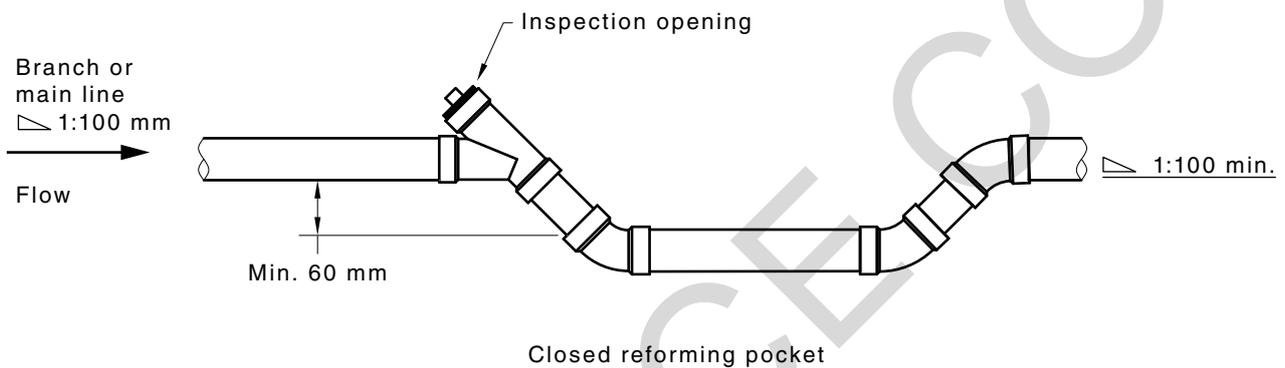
TYPICAL CLOSED TYPE VACUUM REFORMING POCKET
